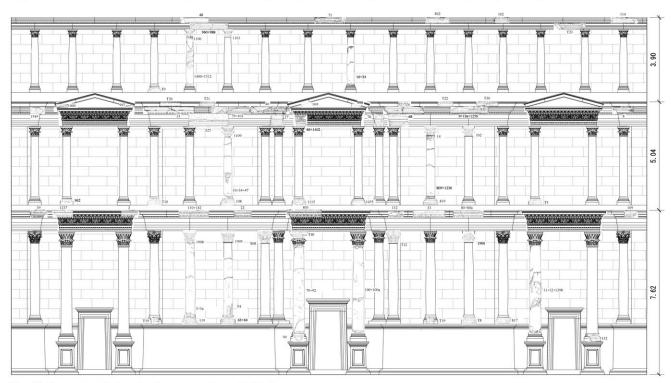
Reconstructed elevation the scaenae frons with blocks
